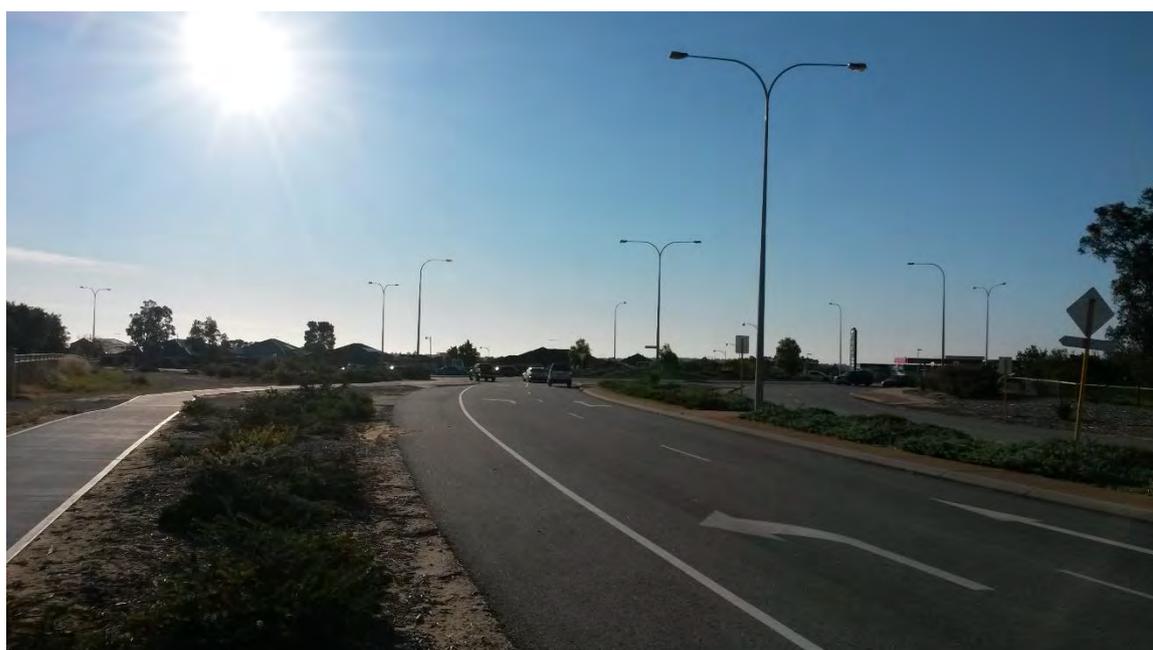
Westbound view along Caporn Street towards Pinjar Road intersection
